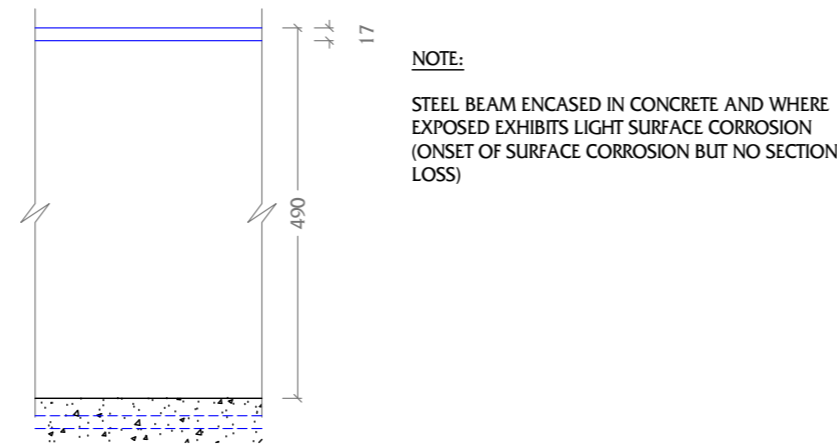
PART ELEVATION LOOKING NORTH SHOWING DETAILS OF BEAM B2 SCALE 1:10
